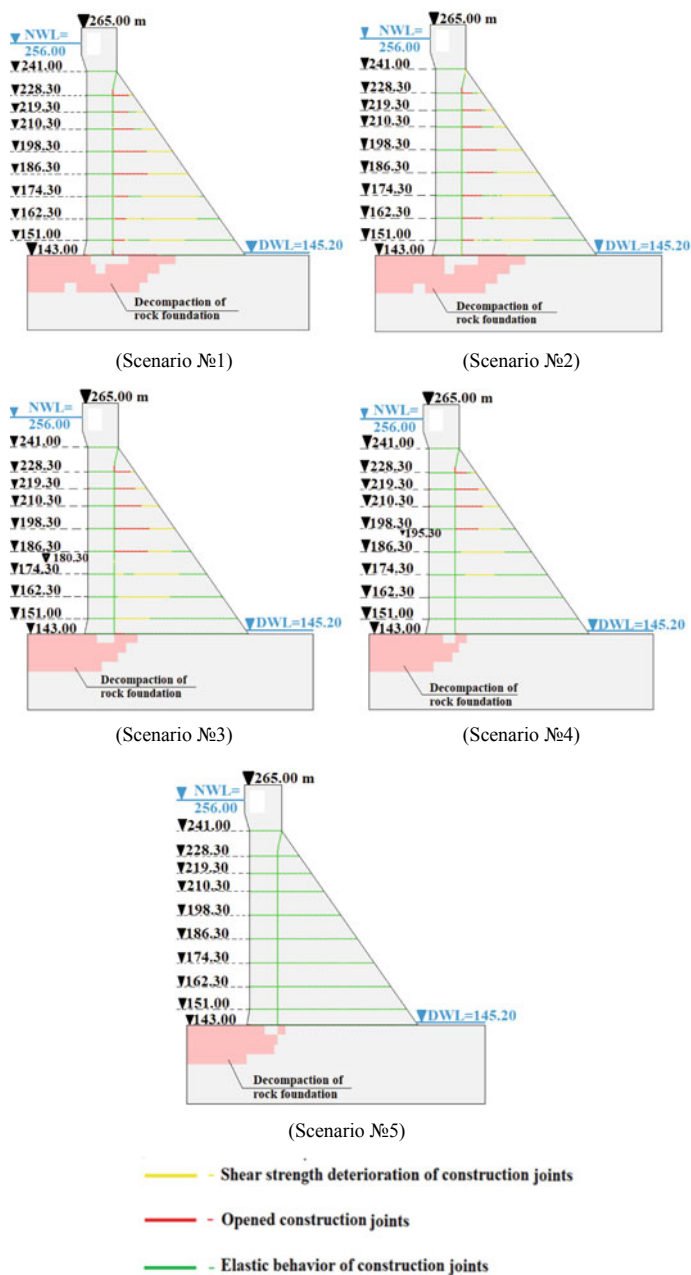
Element state of «Bureyskaya concrete gravity dam–rock foundation» system in consideration of five different scenarios of inter–columnar joint grouting
